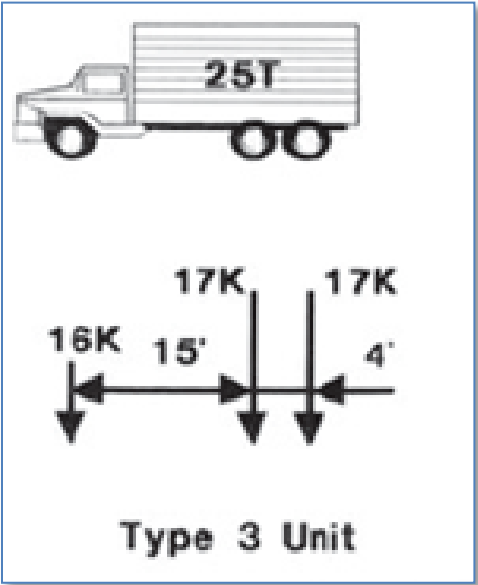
HL-93 and HS-20 25 ton load truck (Type 3)
